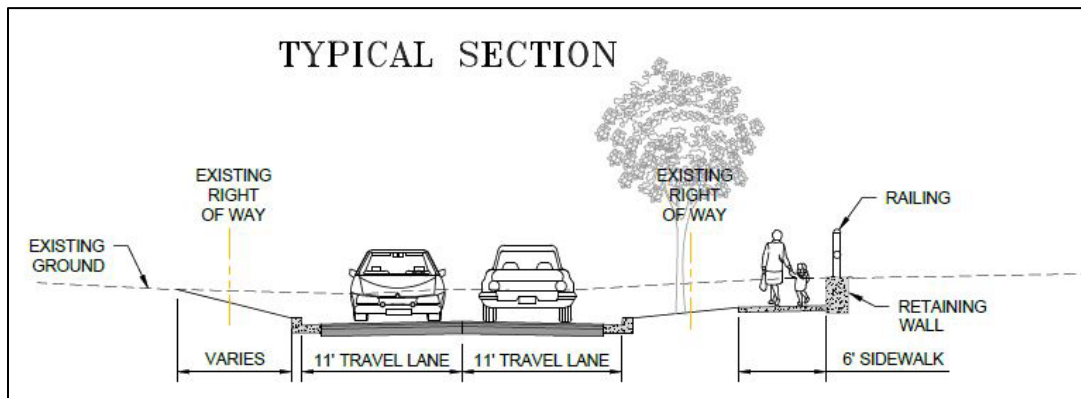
North High Street Extension Alternative 1 – Cross Section west of McDonalds
